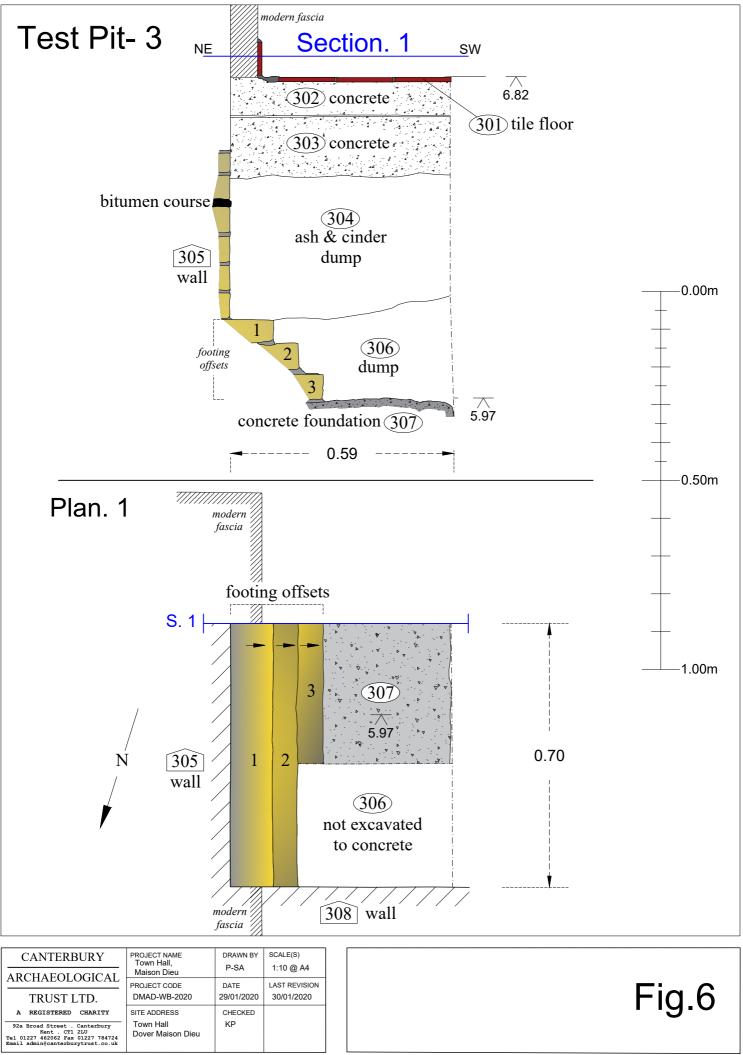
Plan and section through recorded deposits, Test Pit 3
